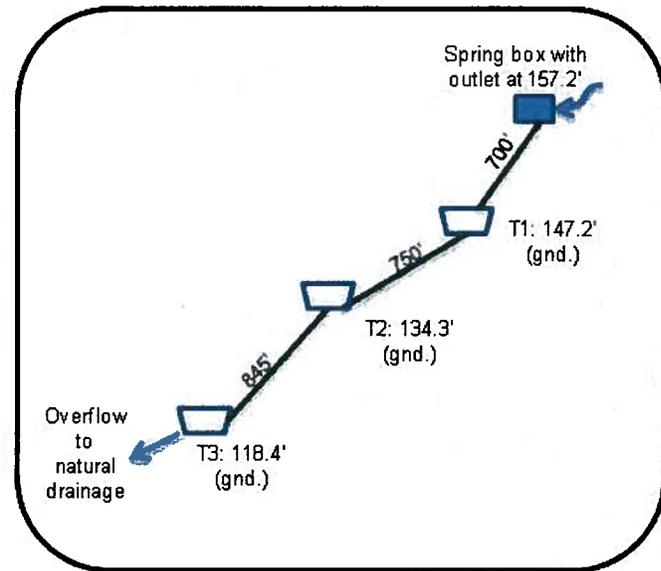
Layout for Example 7 - Cascading Gravity System.
